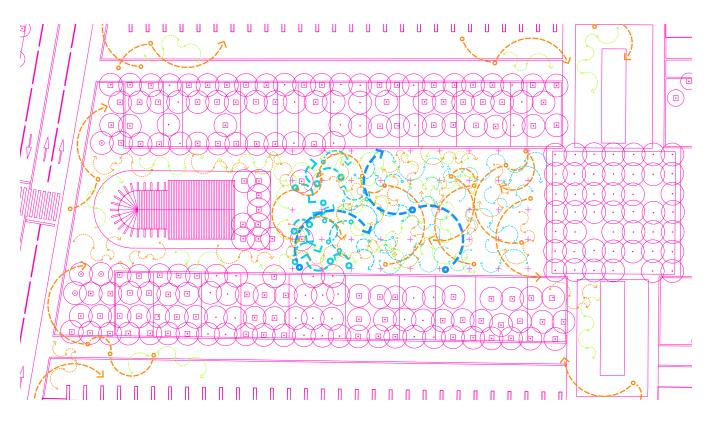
Proposed site plan for installation at Plaza Primero de Mayo.
